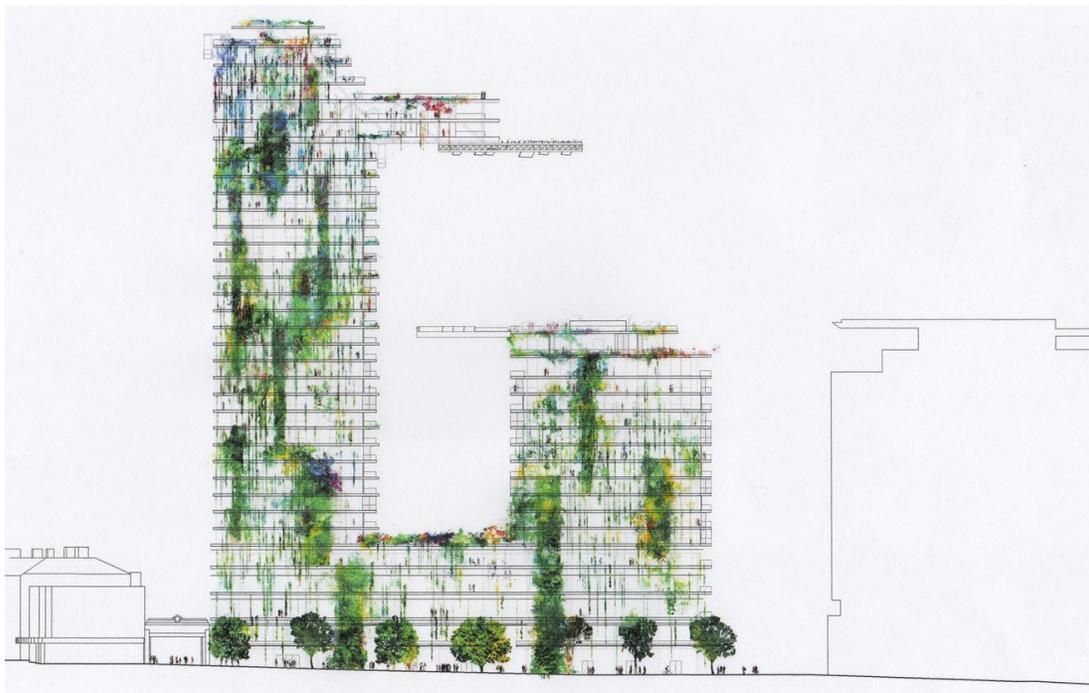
Elevation of the One central park building (Source: <https://www.verticalgardenpatrickblanc.com>)
